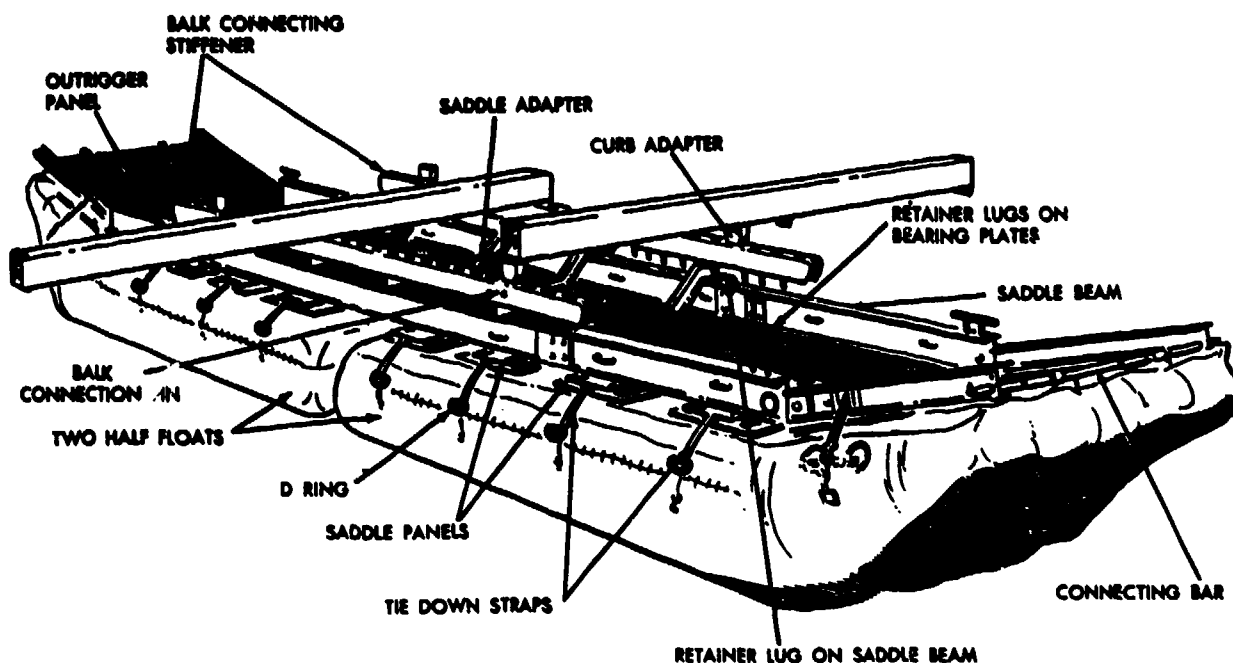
Float and substructure of M4T6 floating aluminum bridge foundation constraints. Details of construction are described in TM 5-210 (Headquarters, Department of the Army 1970).
